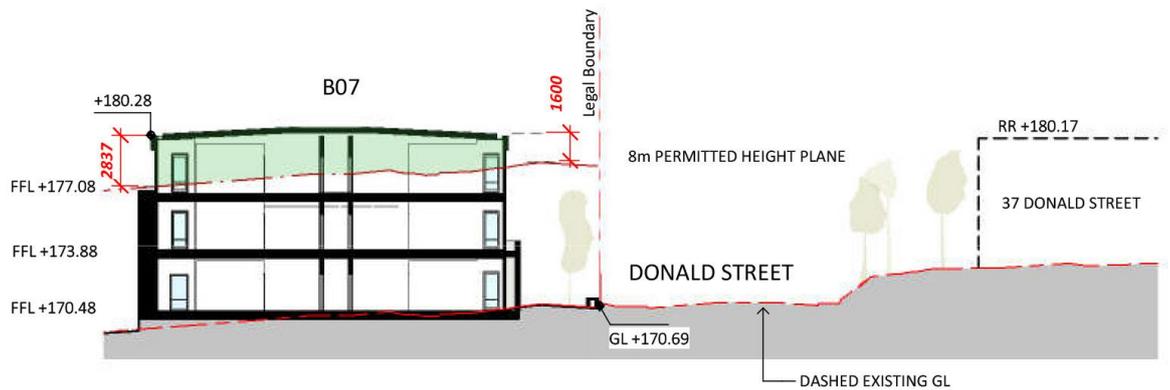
Cross Section depicting relationship between Building B07 and property at 37 Donald Street
